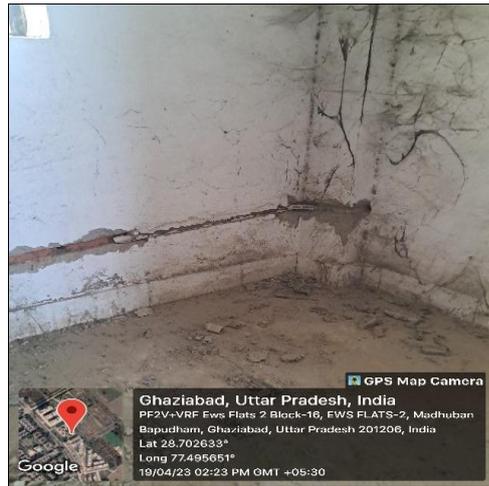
Damaged condition of dwelling units under Madhuban Bapudham scheme
